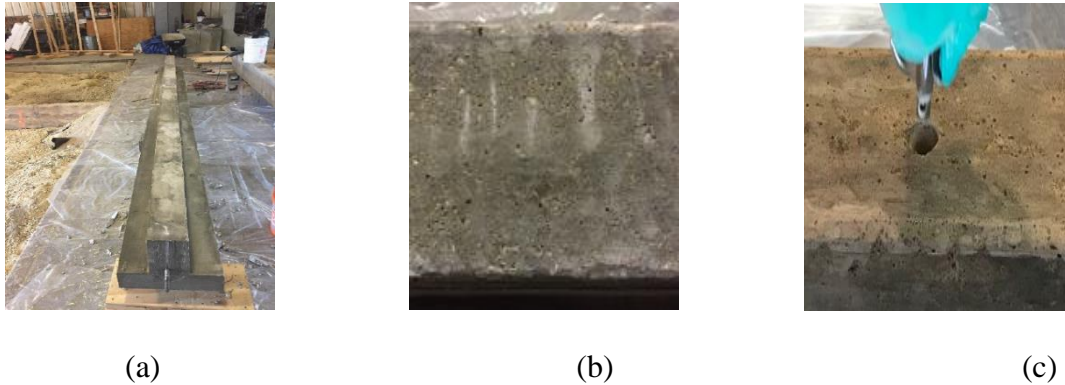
Surface preparation (a) before surface preparation; (b) after rounding and sandblasting the surface; (c) clearing away the dust form the holes
